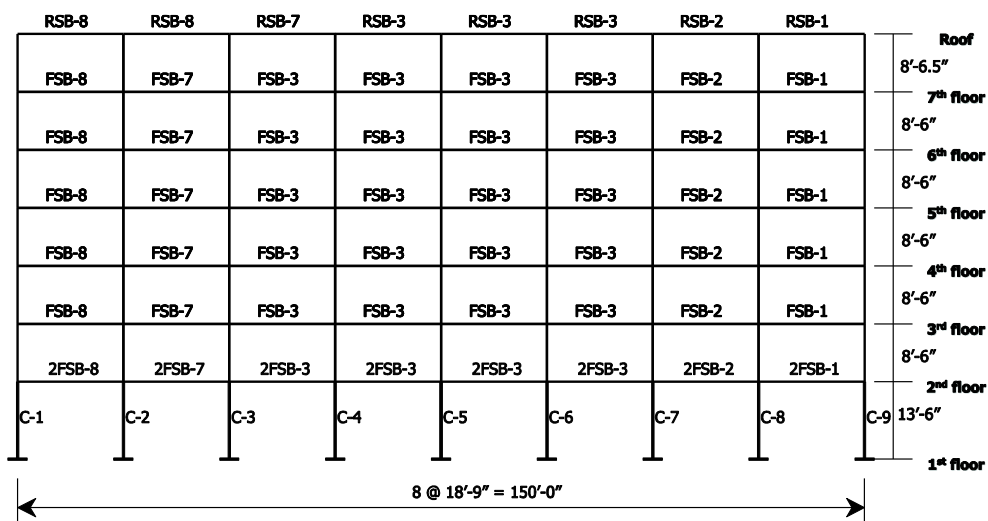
Column-beam scheme for longitudinal Van Nuys frame
